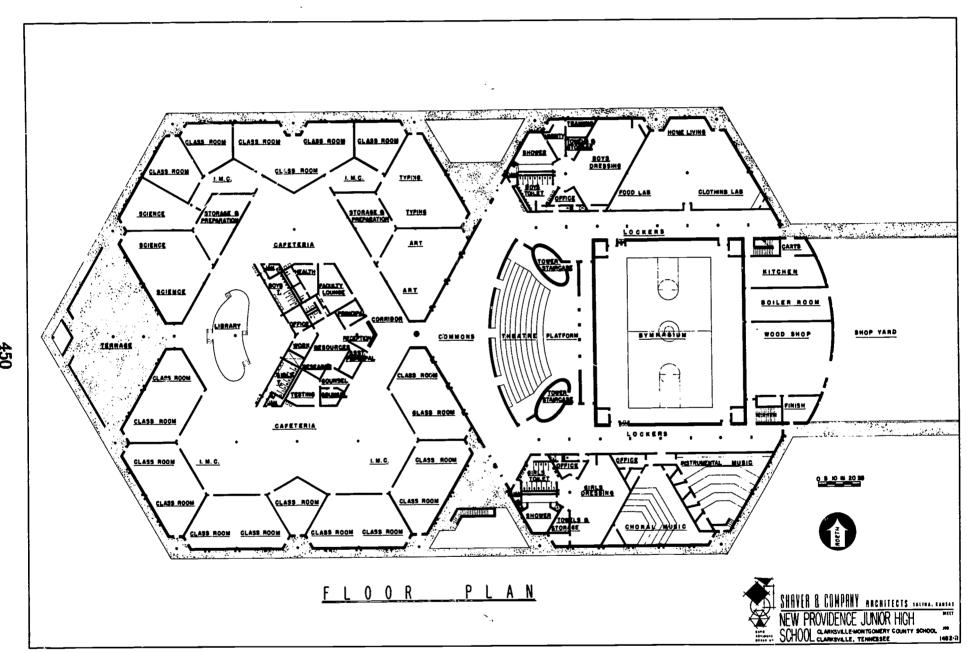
Floor plan of Clarksville-Montgomery Junior High School
